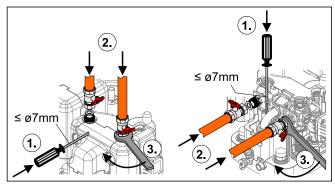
Fix the hydraulic block in place when connecting to the top (left) or to the rear (right)
